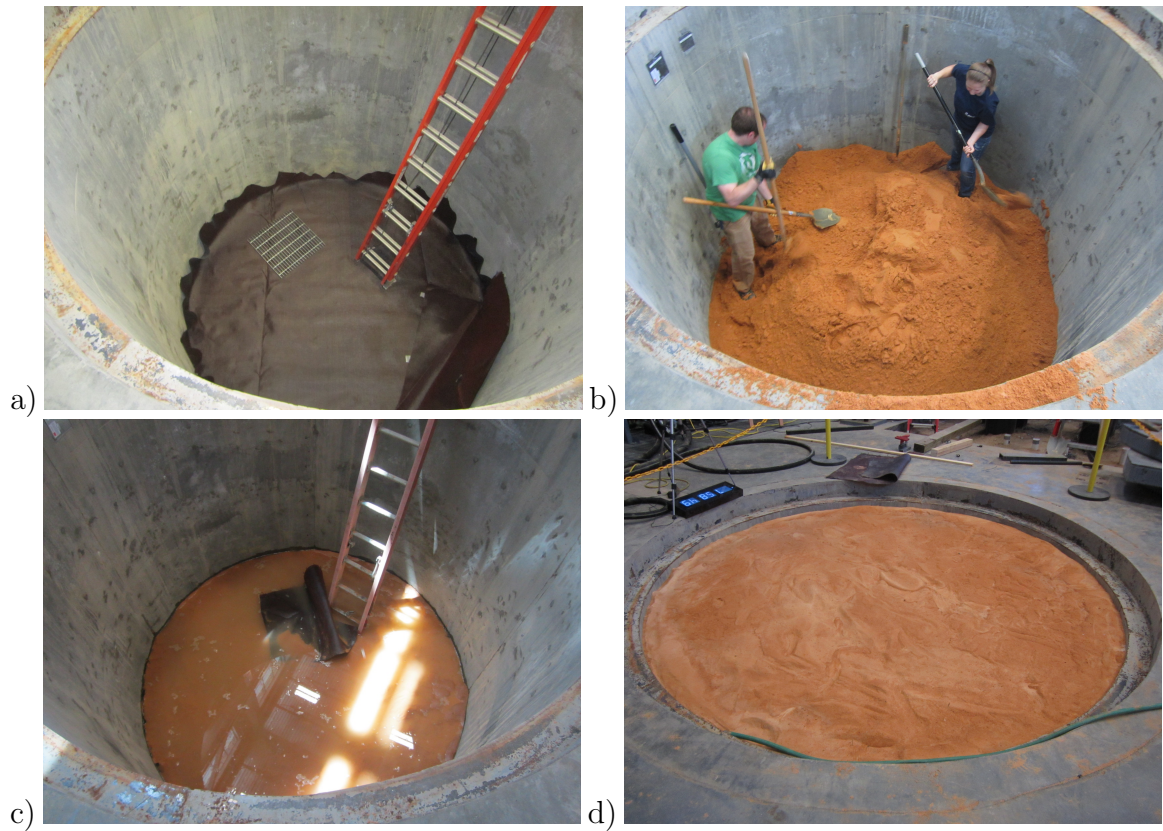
Preparation of geotechnical testing pit at EPIC Structural High Bay Laboratory: a) installation of geosynthetic filter to protect submersible pump b) adding a lift of red mortar sand to the pit, c) flooding pit with water to saturate and compact soil through drainage cycles, d) fully filled soil pit
